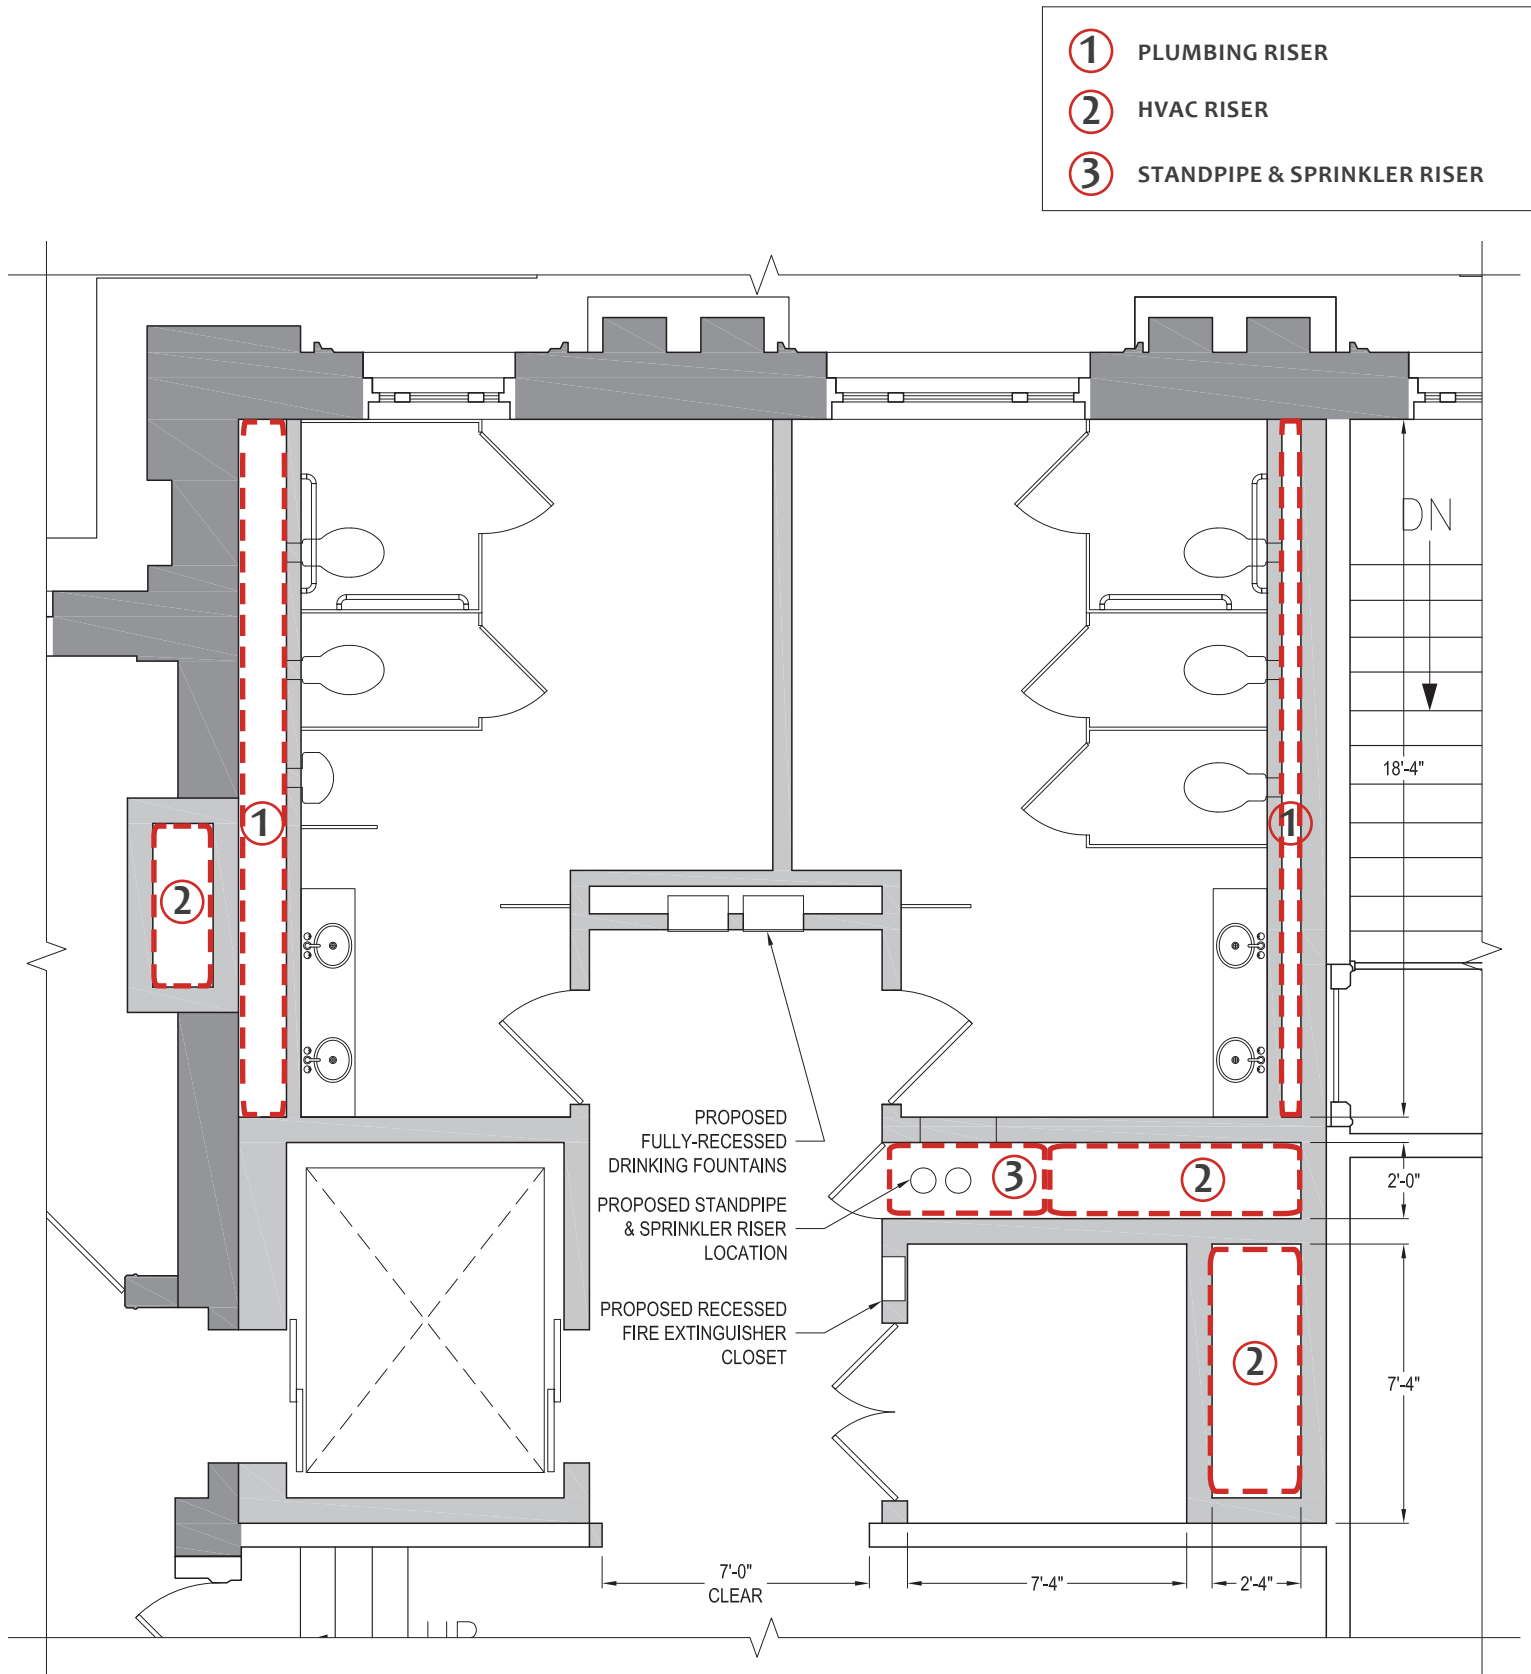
Third Floor Level [East] Proposed Service Core.
